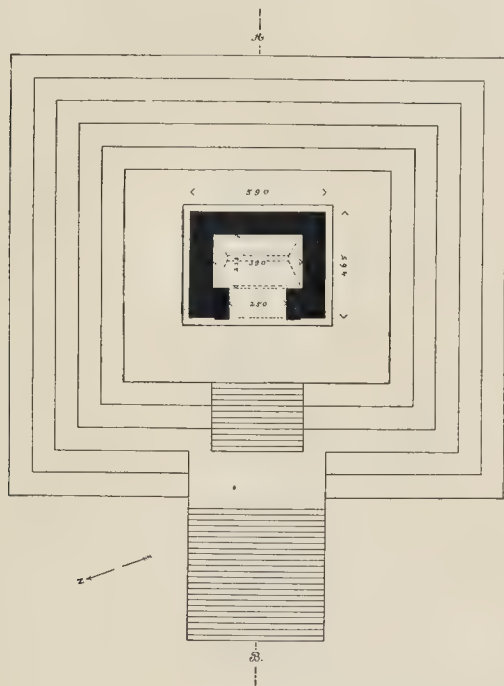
CHÁNCALA: PLAN OF TEMPLE AND SUBSTRUCTURE.
